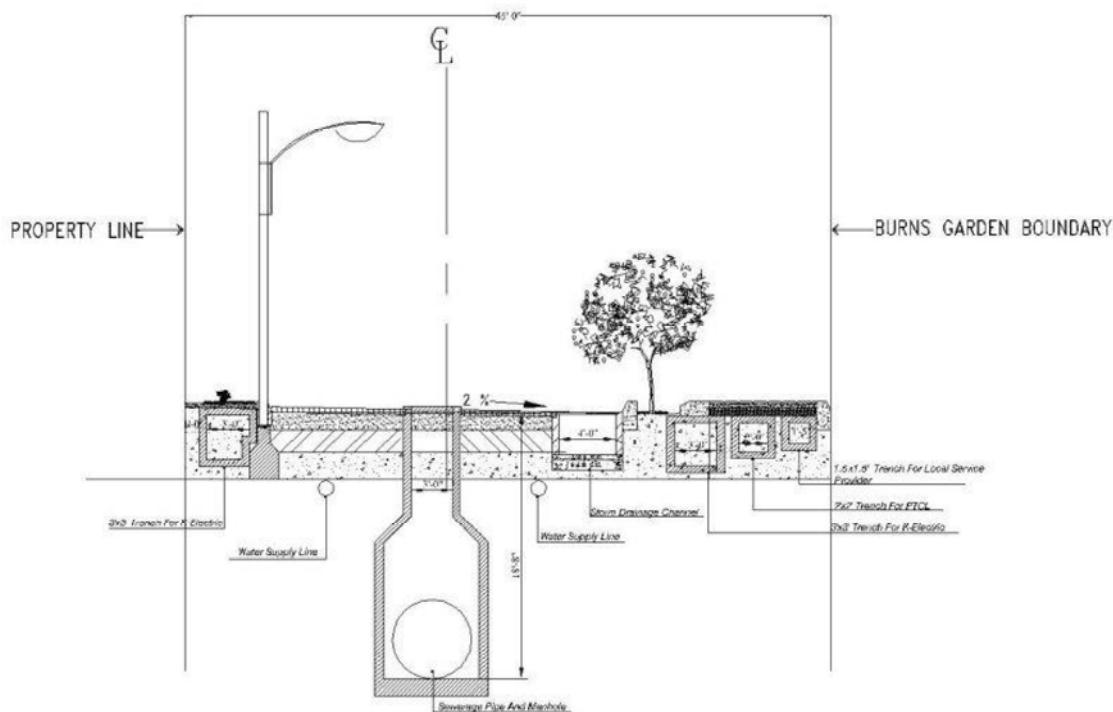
Propose road infrastructure including sewerage and stormwater drainage channels
